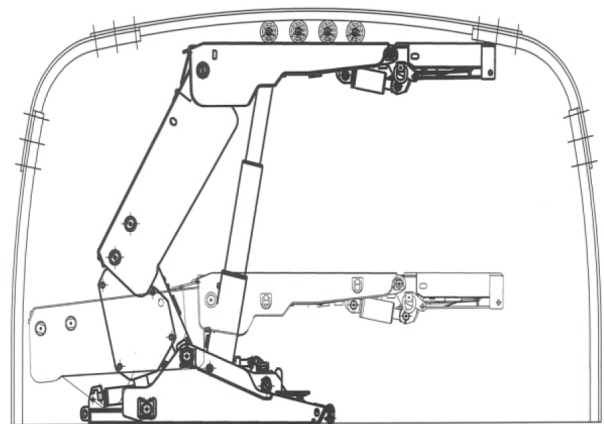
ŁPrP frame variant K with an installed powered support unit
